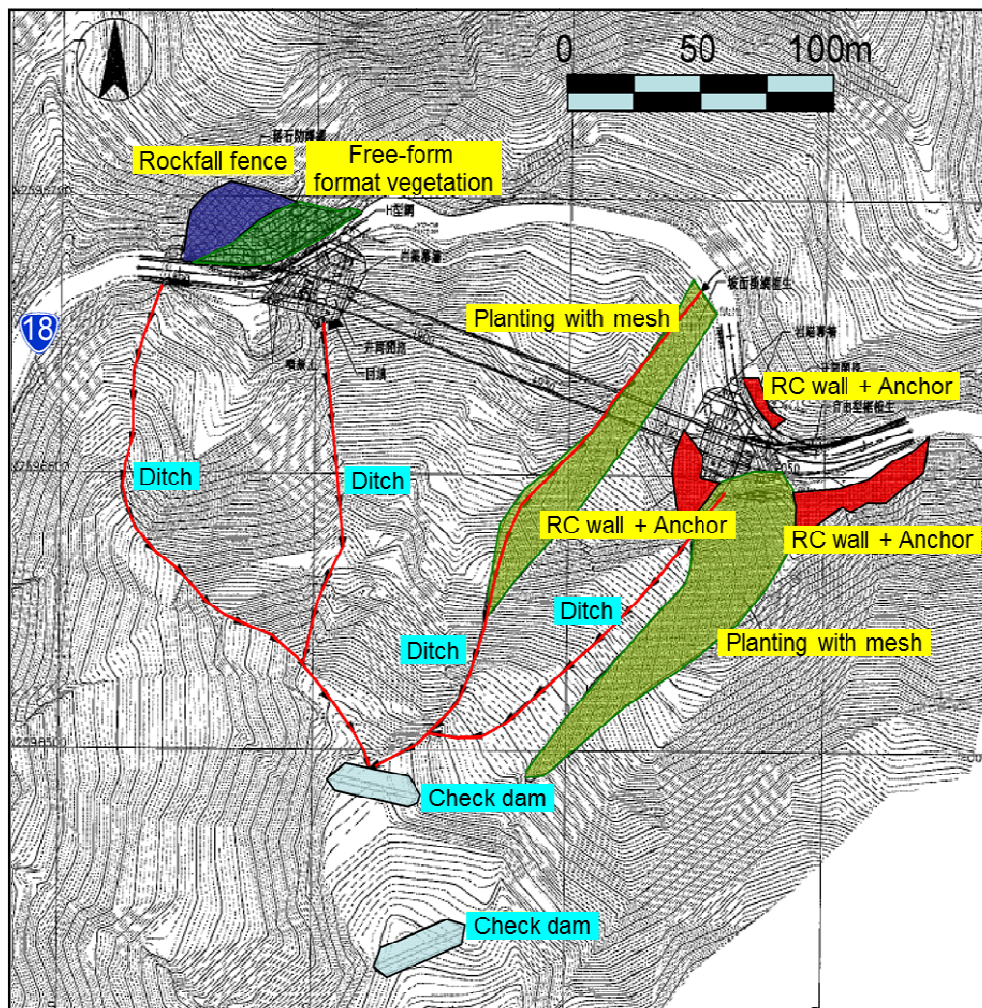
Layout of repair works at Mileage 71.1k of Alishan Route 18
